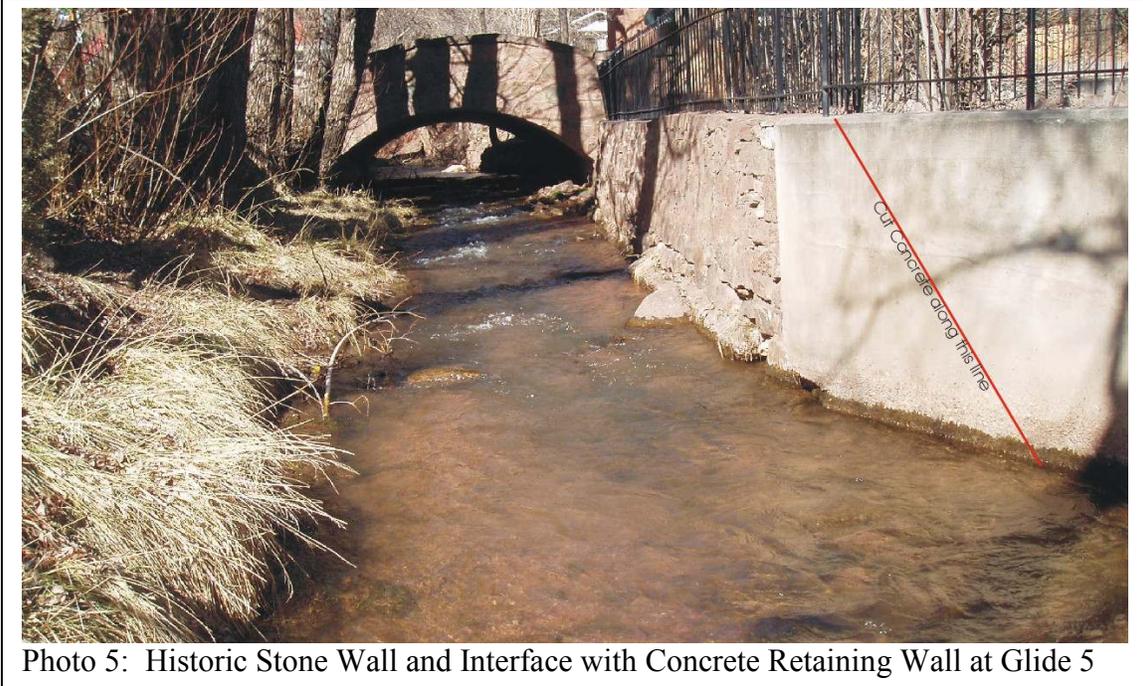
Historic Stone Wall and Interface with Concrete Retaining Wall at Glide 5
